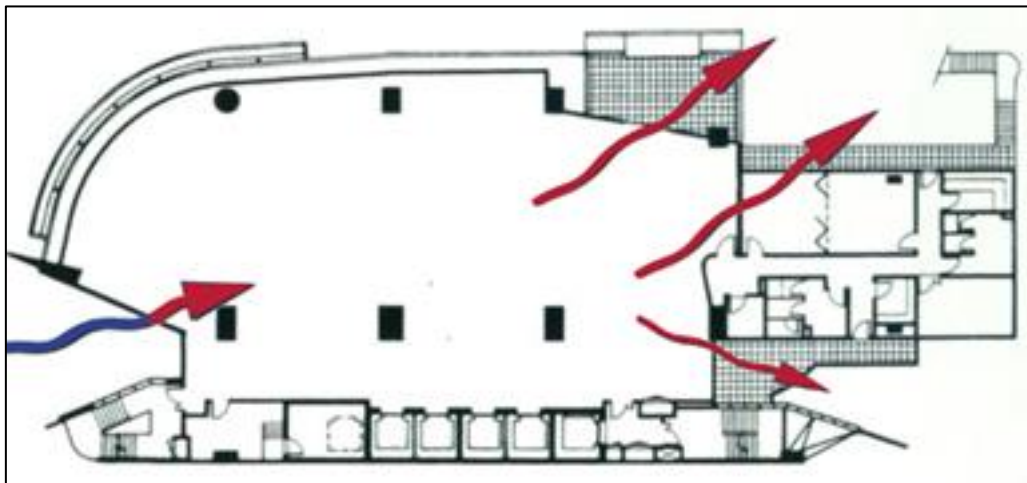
Plan of the building showing the sun path diagram (A. Wood & Salib, 2013)
